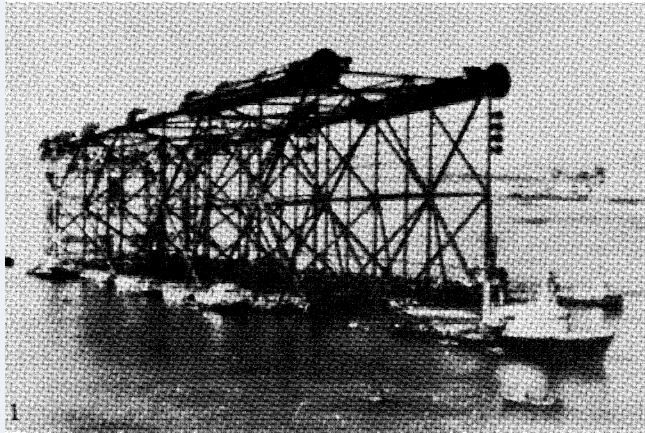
North Sea oil platform 'Thistle A' being towed to its final position, containing thousands of welds and spars to be tested and maintained.
